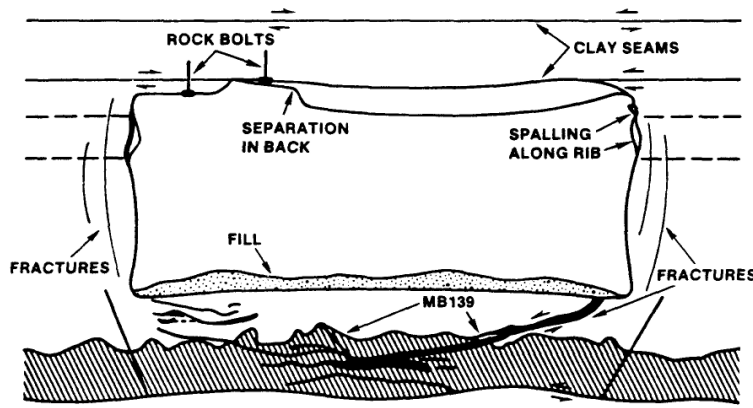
Typical macrofracturing and damage surrounding a room excavated in bedded salt (Borns and Stormont, 1988)
